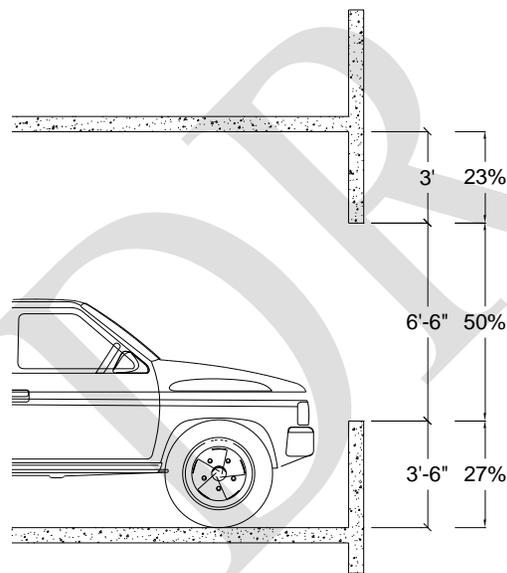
Cross-section of 50% Opening-to-Wall Height Ratio
